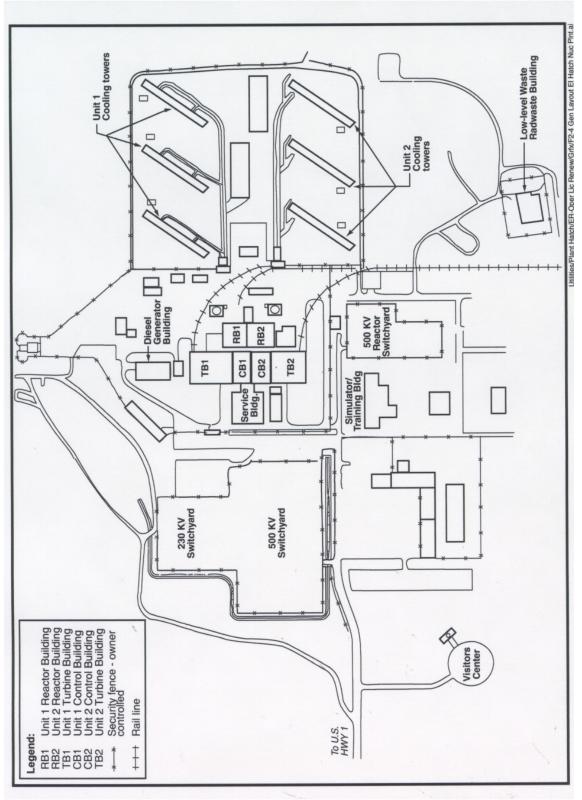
HNP Edwin I. Hatch Nuclear Plant site plan
